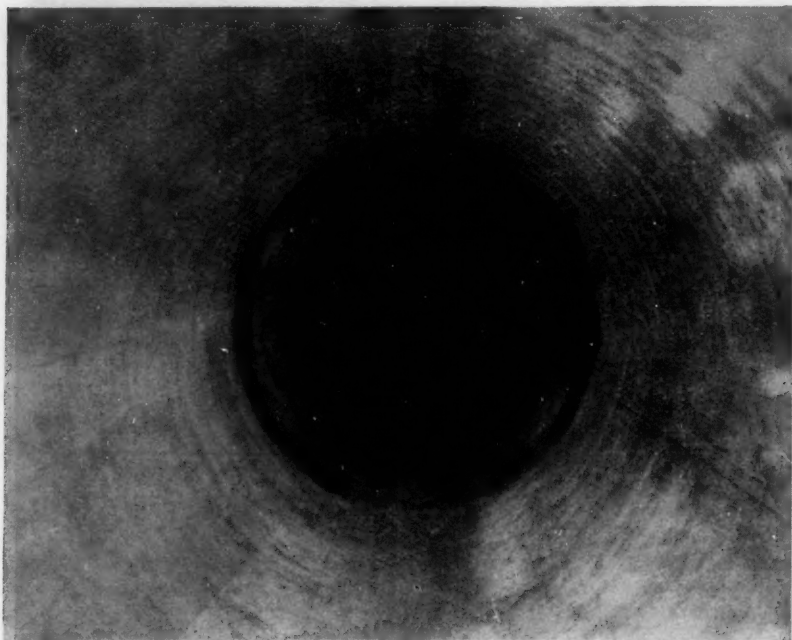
PROVIDENCE, R. I. 60-INCH REINFORCED-CONCRETE PIPE CAST IN OILED STEEL FORMS IN 12-FOOT LENGTHS
